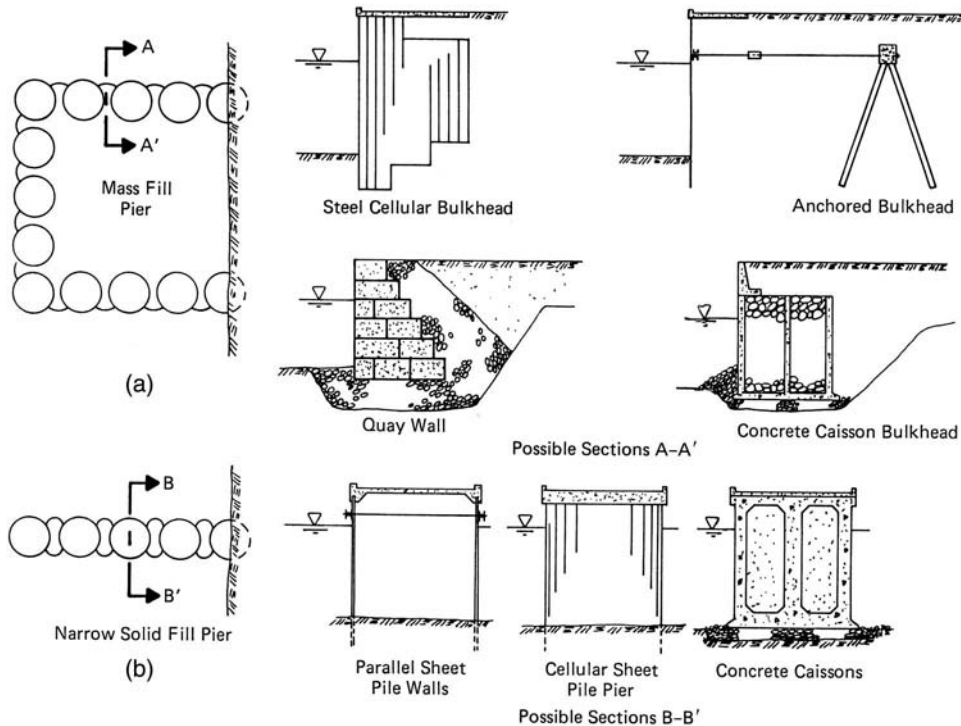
Solid-fill pier configurations: (a) mass-fill pier; (b) narrow solid-fill pier
